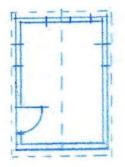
Floorplan of workshop sketched by Geoff Ashley (2016, p32).
